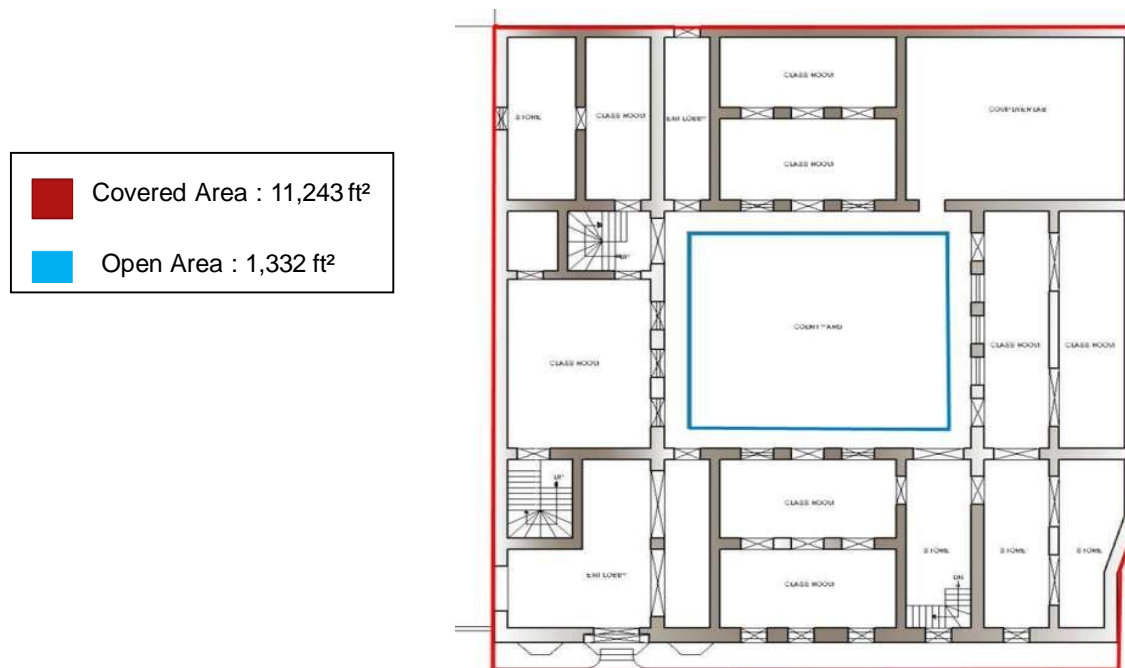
Victoria School (Haveli Nau Nihal Singh) Floor Plan Area Distribution
